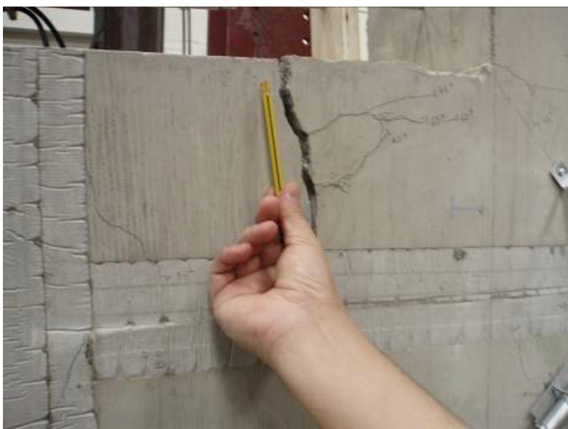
Bond failure of concrete section having smooth SMA rebar. Adapted from [3].
